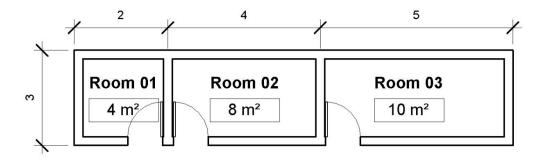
Area and Dimensions of Processing Center (Outer Dimensions in meter)
